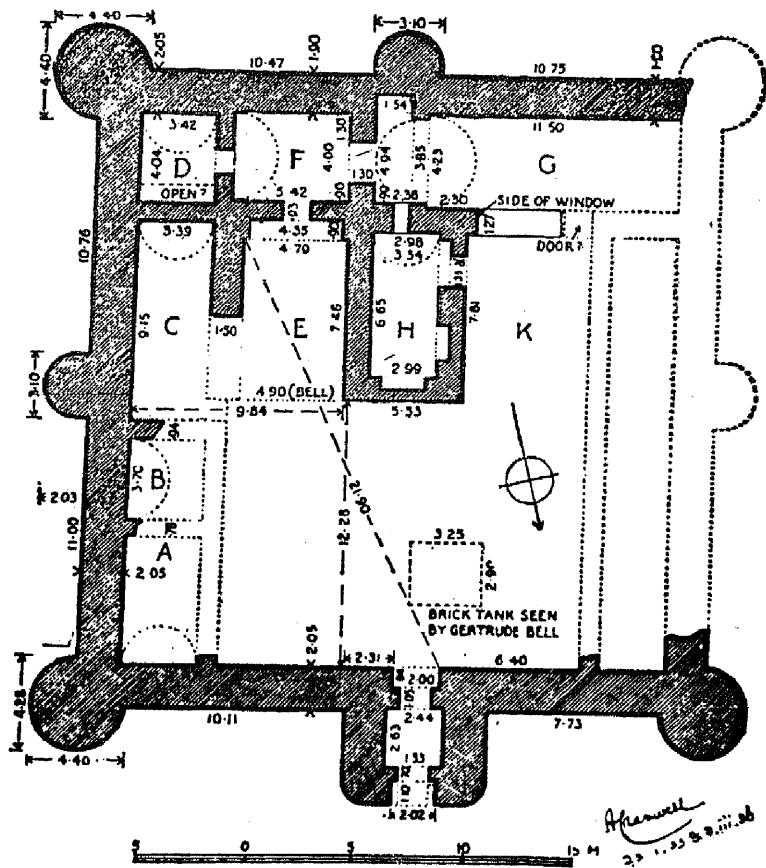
АГАИЛЫ: plan. Scale 1:200.
